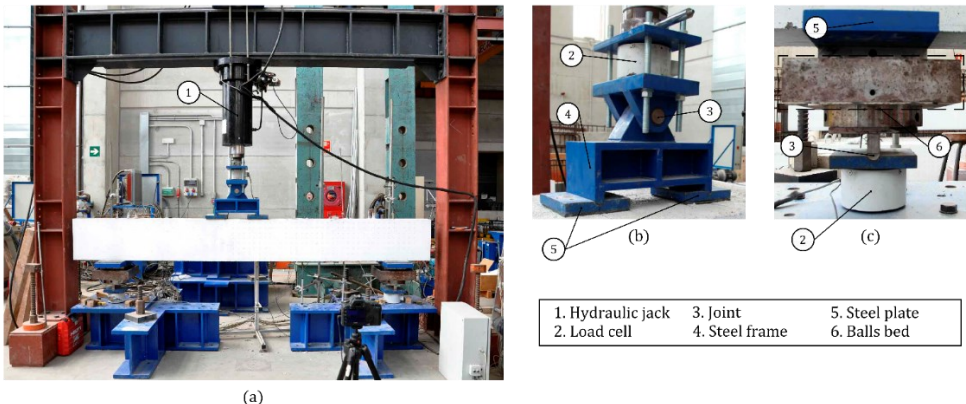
Shear test experimental setup: (a) global view; (b) loading system; (c) bearing points system.
